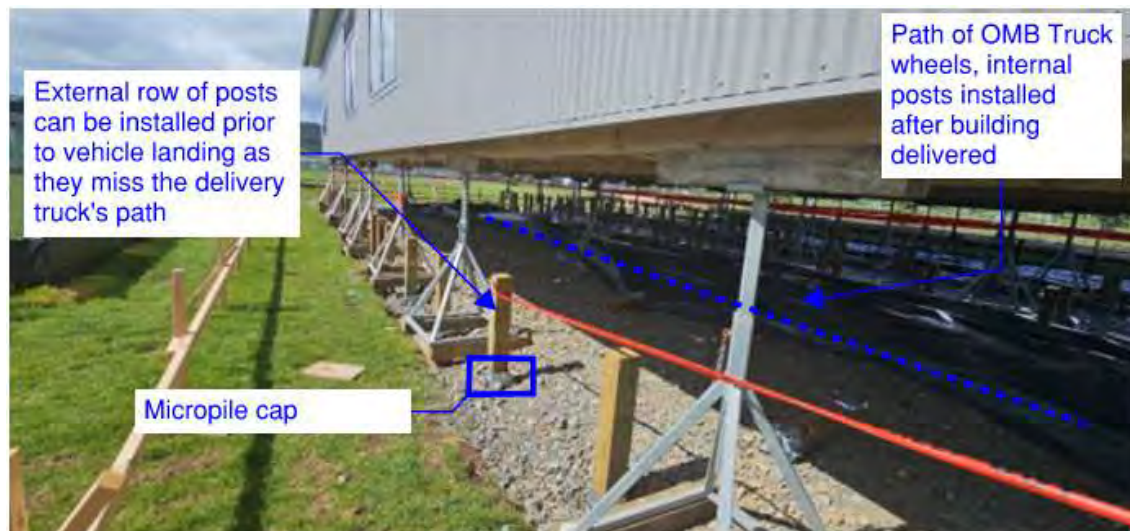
Modular building landing on temporary supports with micro steel pile and pile posts underneath
